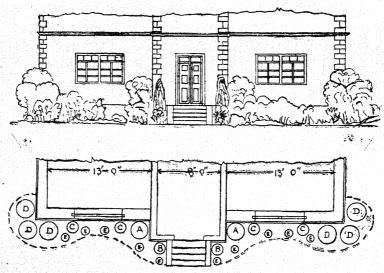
& 25 Showing plantation of shrubs in front of a building
